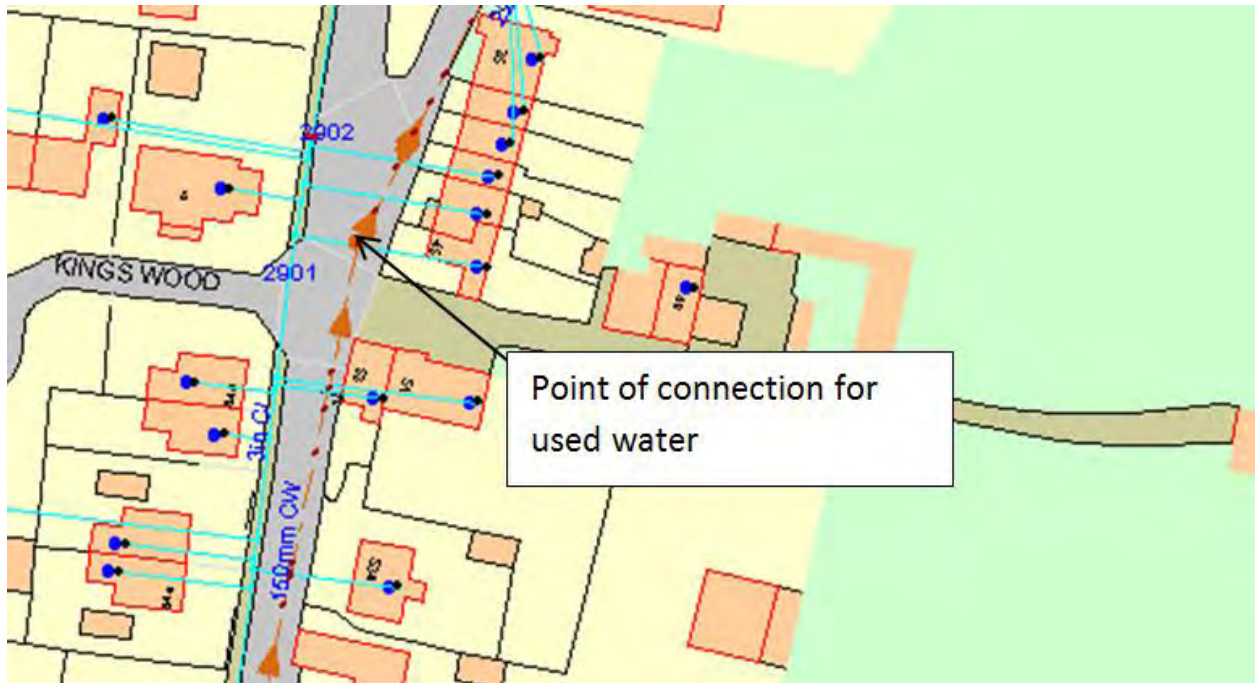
Showing your used water point of connection at manhole 2901 with a Cover Level of 9.27m and an Invert Level of 7.66m.
